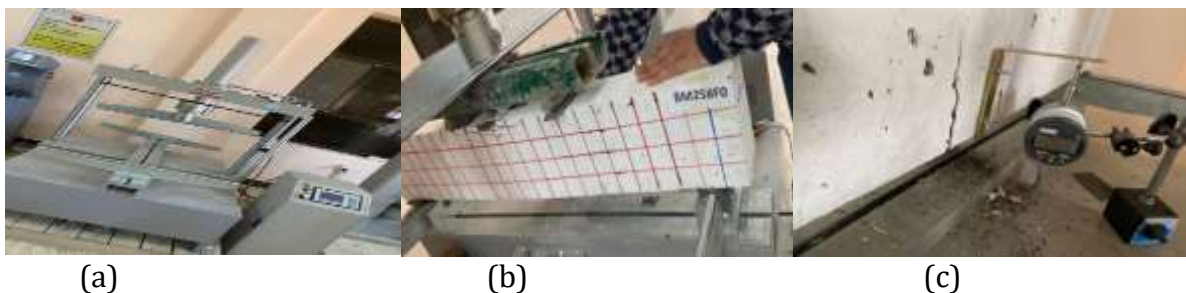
(a) Flexural testing machine , (b) test of beam and (c) The digital dial gauge used
